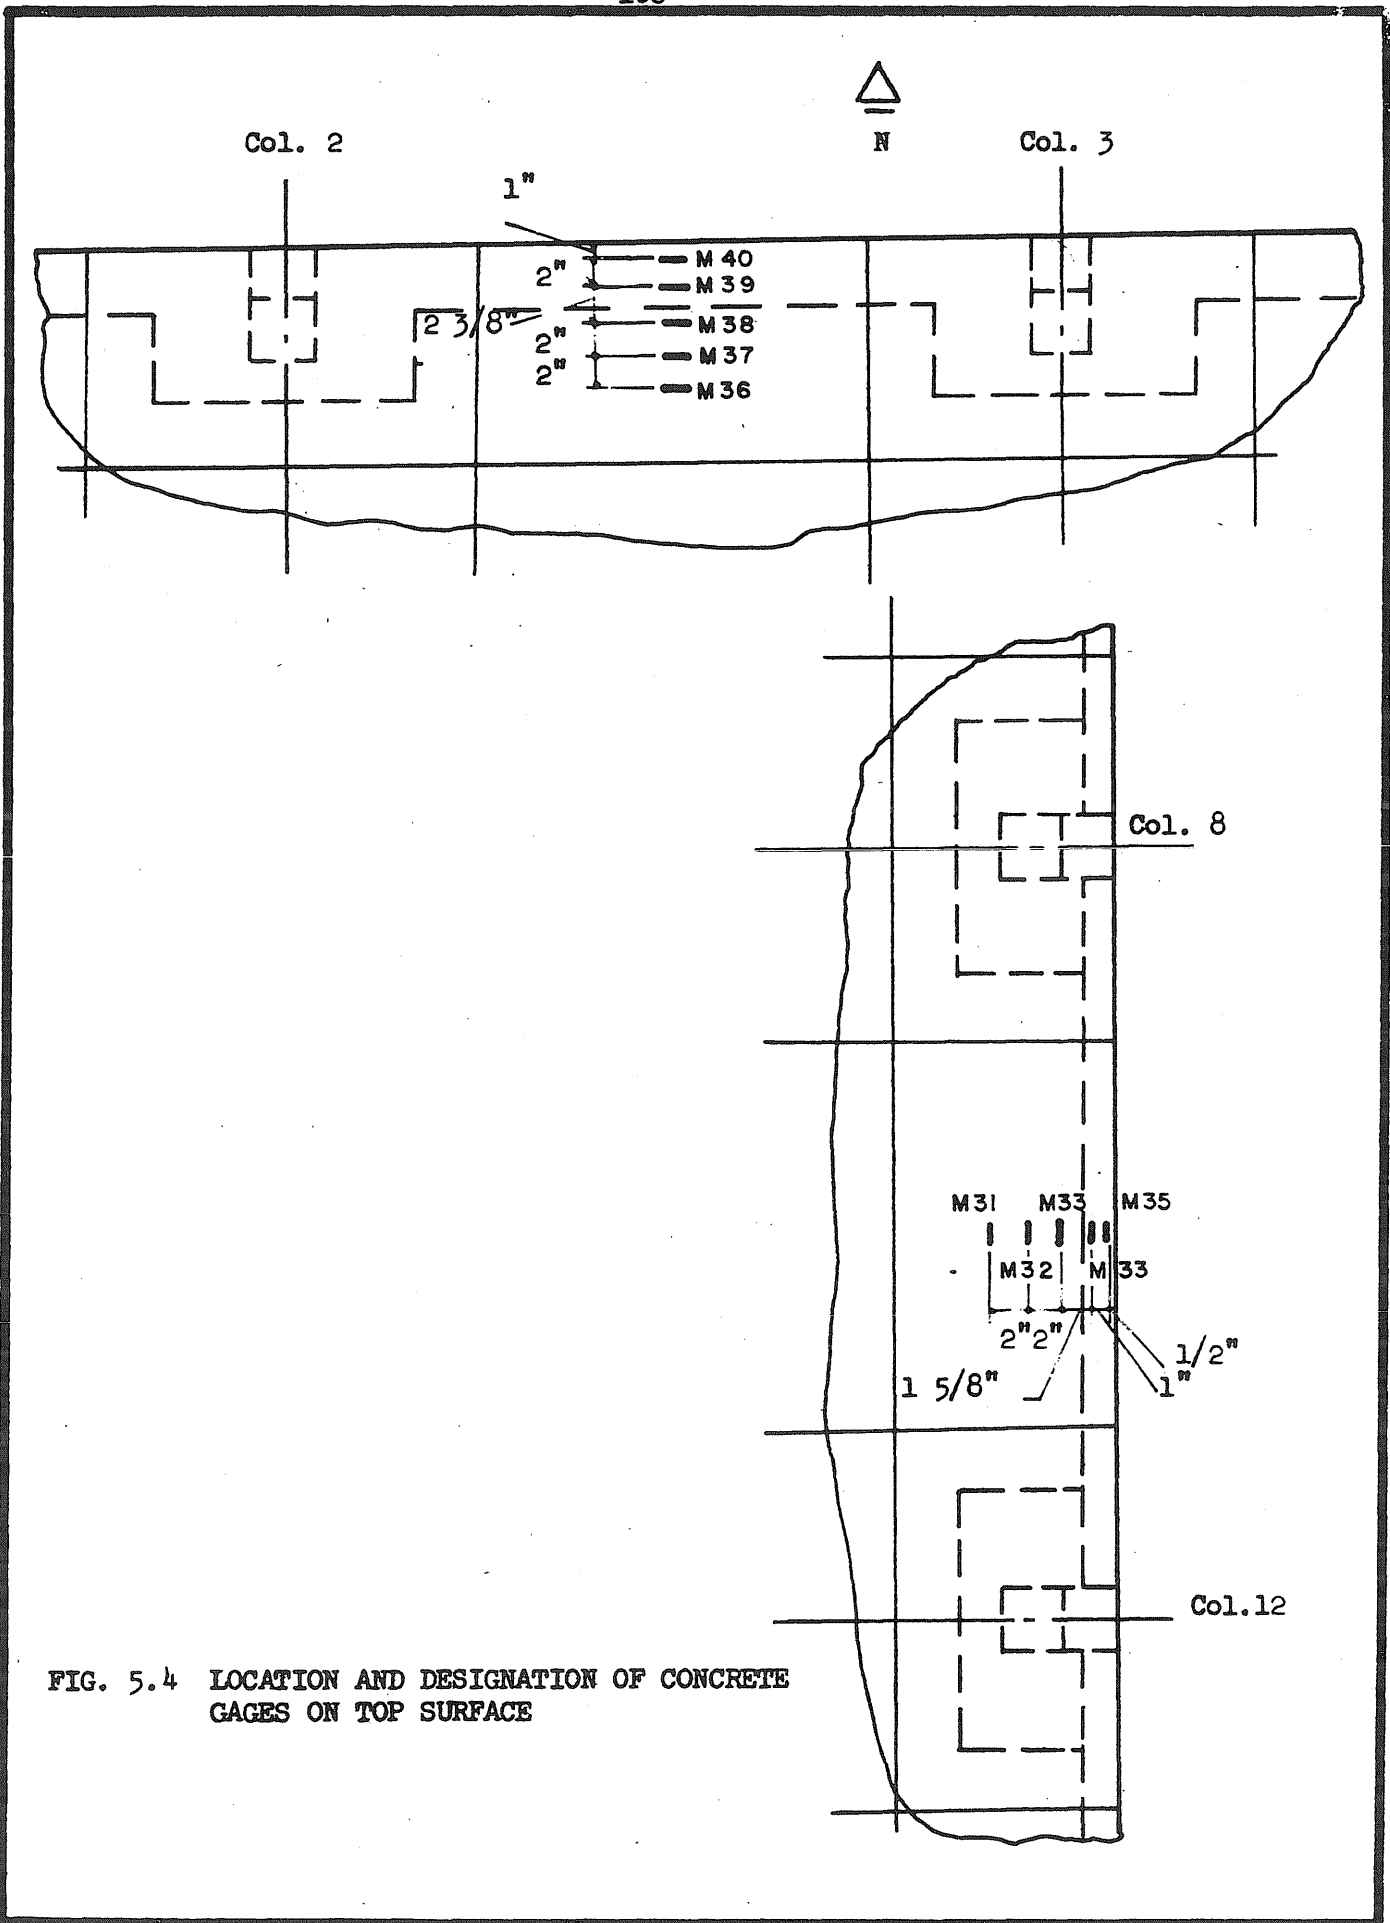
LOCATION AND DESIGNATION OF CONCRETE GAGES ON TOP SURFACE
